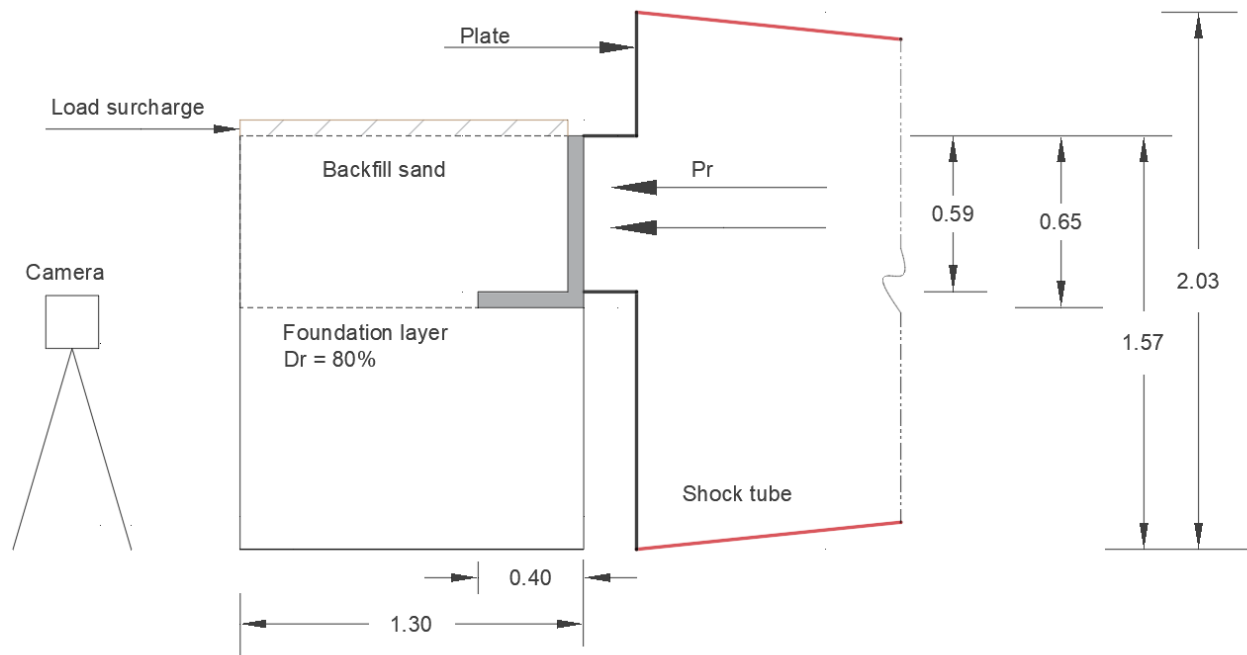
Test setup and preparation; dimensions in m (schematic)
